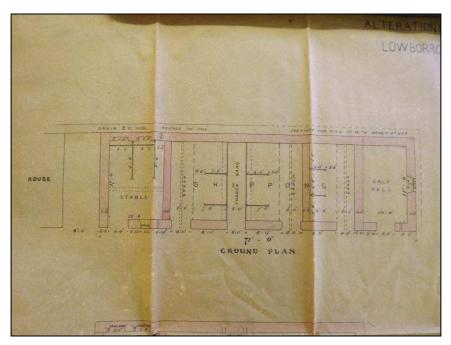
Undated floor plan for alterations to a farm building at Low Borrowdale Farm (Kendal Archives Ref: WDB 35 1079)
